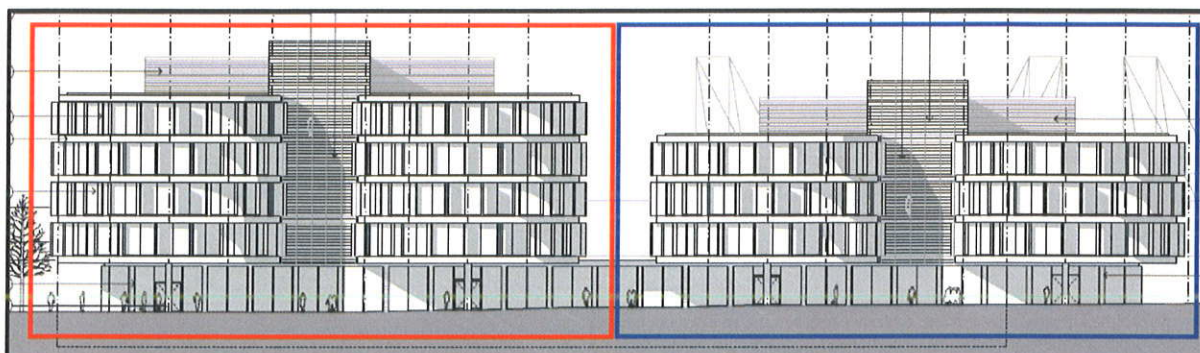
Sarah Durack Avenue Elevation (Red – Building A and Blue - Building B)
